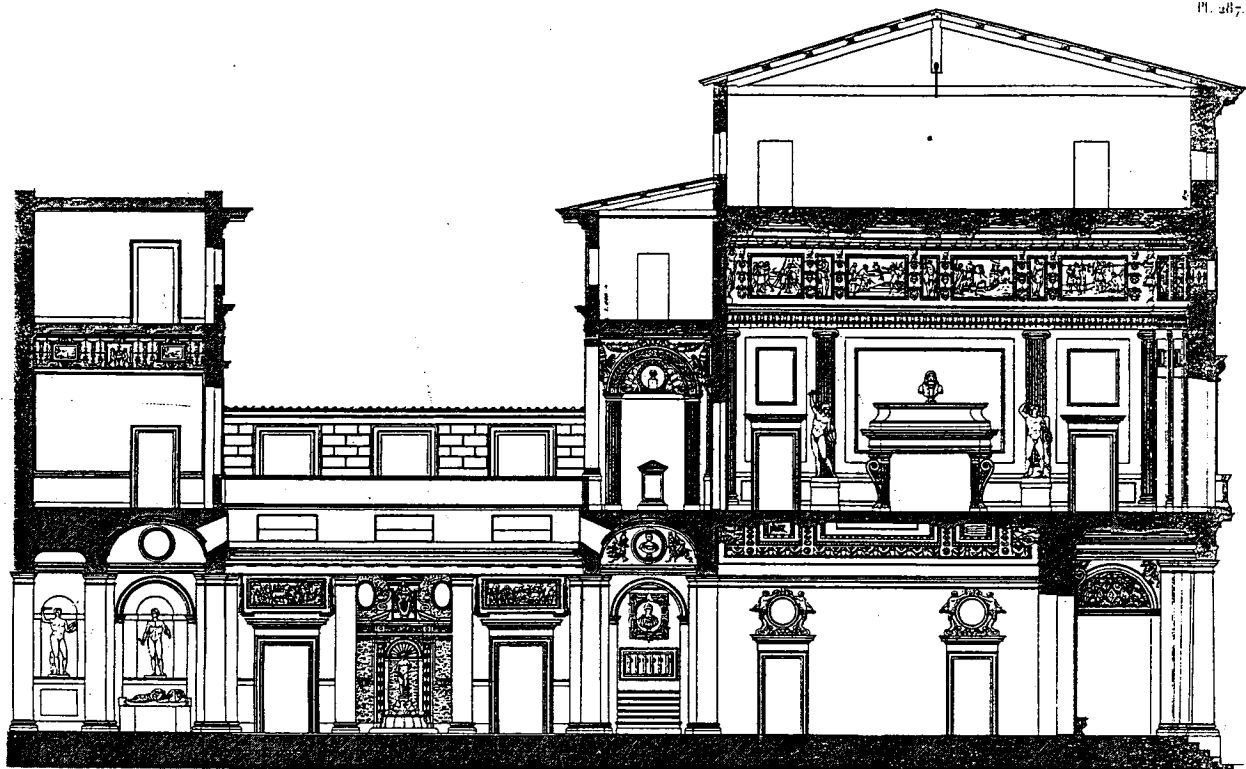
Palazzo Pietro Massimo: section (from Letarouilly)
